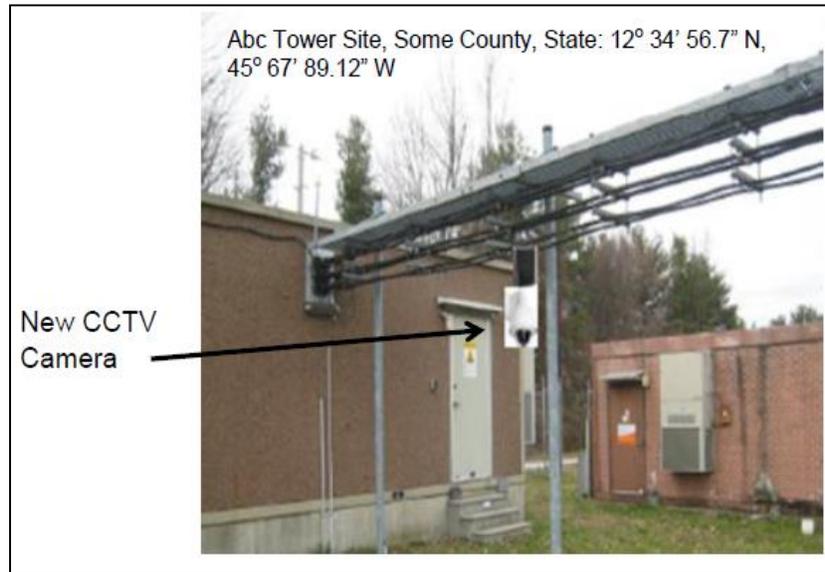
Ground-level photograph with graphic showing proposed equipment installation.
